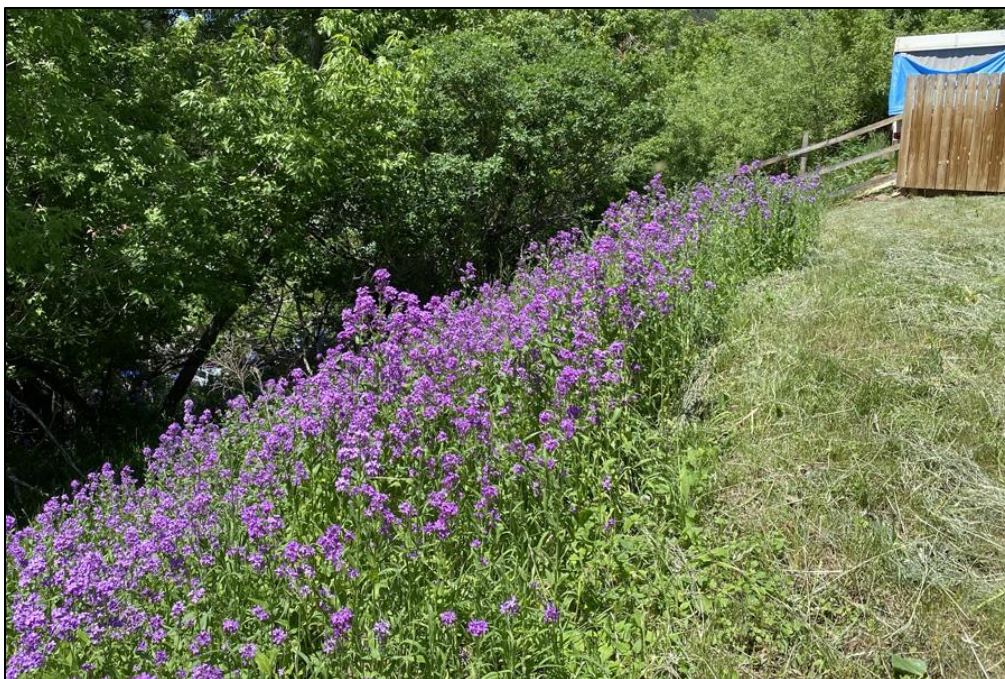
Photograph from southwest corner of lot at proposed retaining wall location facing northwest. L. Ramirez 06/11/2021.
